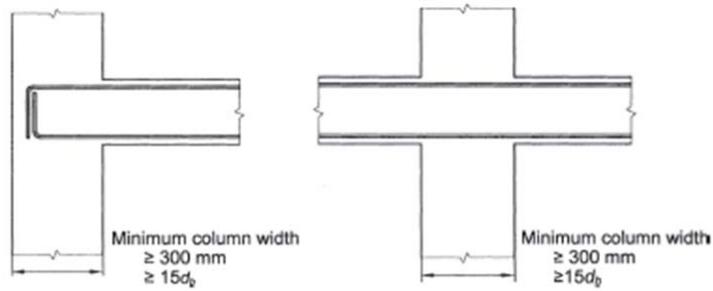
MINIMUM SIZE OF RC COLUMNS BASED ON DIAMETER OF LARGEST LONGITUDINAL REINFORCEMENT BAR IN BEAMS FRAMING INTO IT
